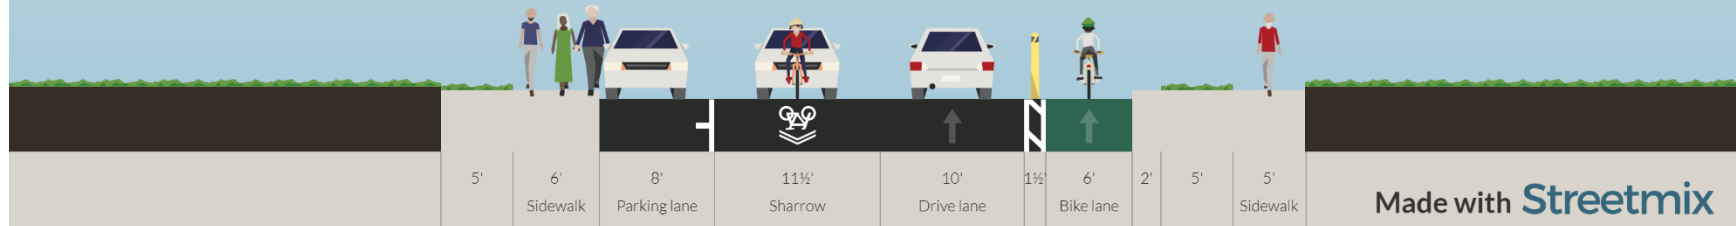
ADA Parking Segment (Proposed Typical Section)
